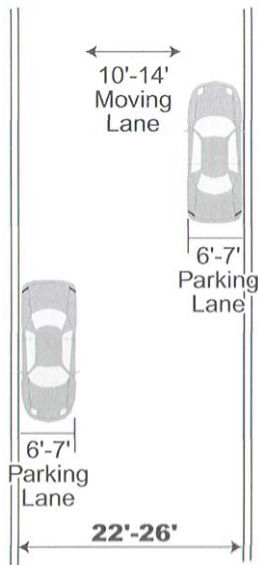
Narrow parking lane configurations for street parking (Sources: Right, Kulash, 2002, p. 24)
